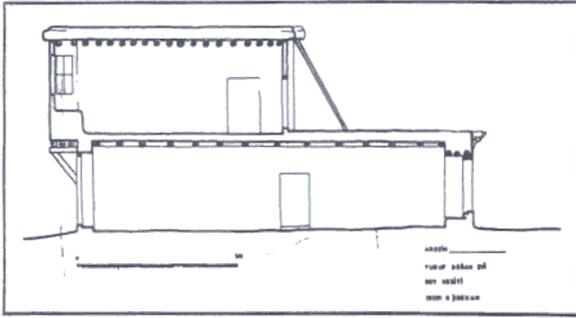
Longitudinal section of Yusuf Doğan's house in the village of Arozik (A. Alpöge).
